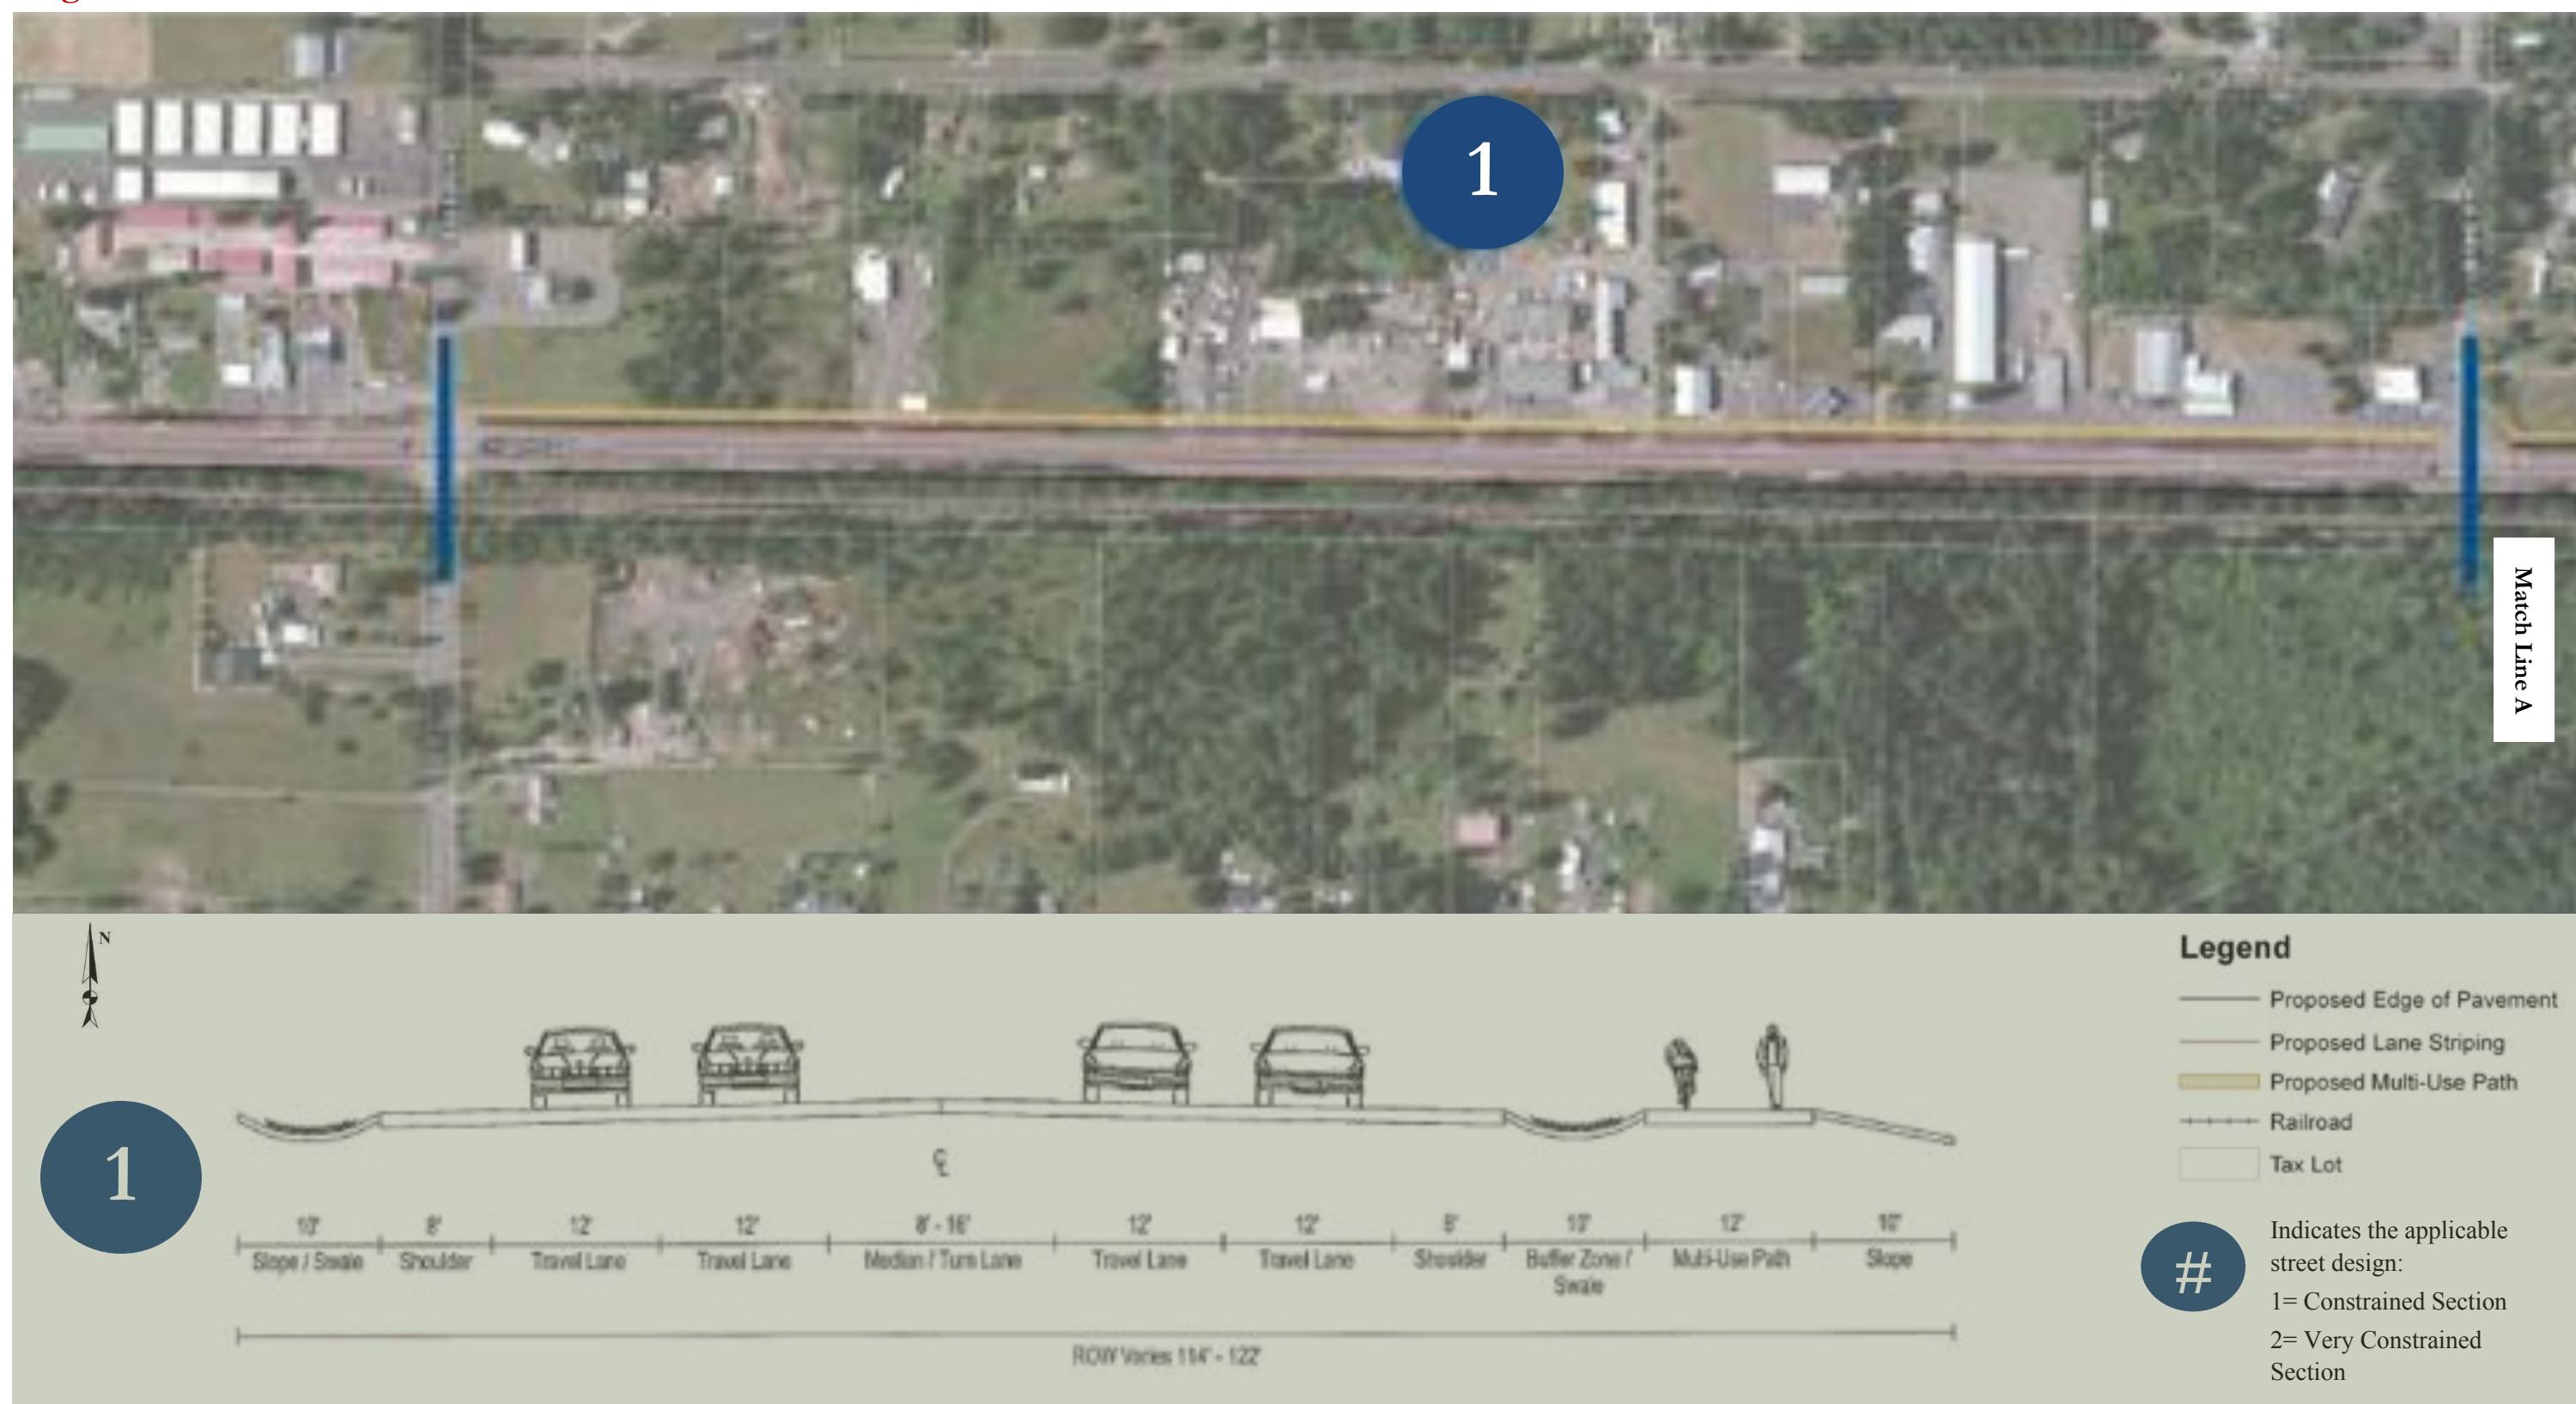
Recommended Corridor Plan: Ellmaker Road to Shady Rest Drive
